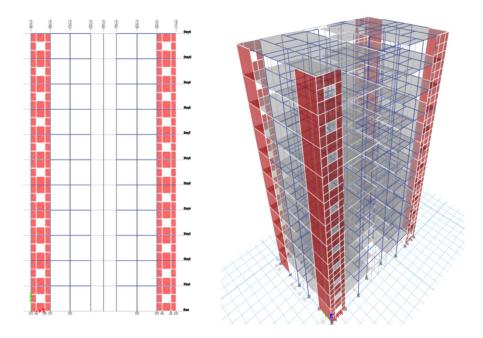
Two-dimensional and three-dimensional views of a multi-story construction with a perforated shear wall (pattern 2)
